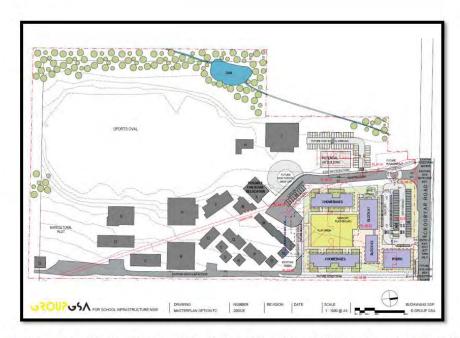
Masterplan option showing the locations of new buildings (Group GSA 2020).
